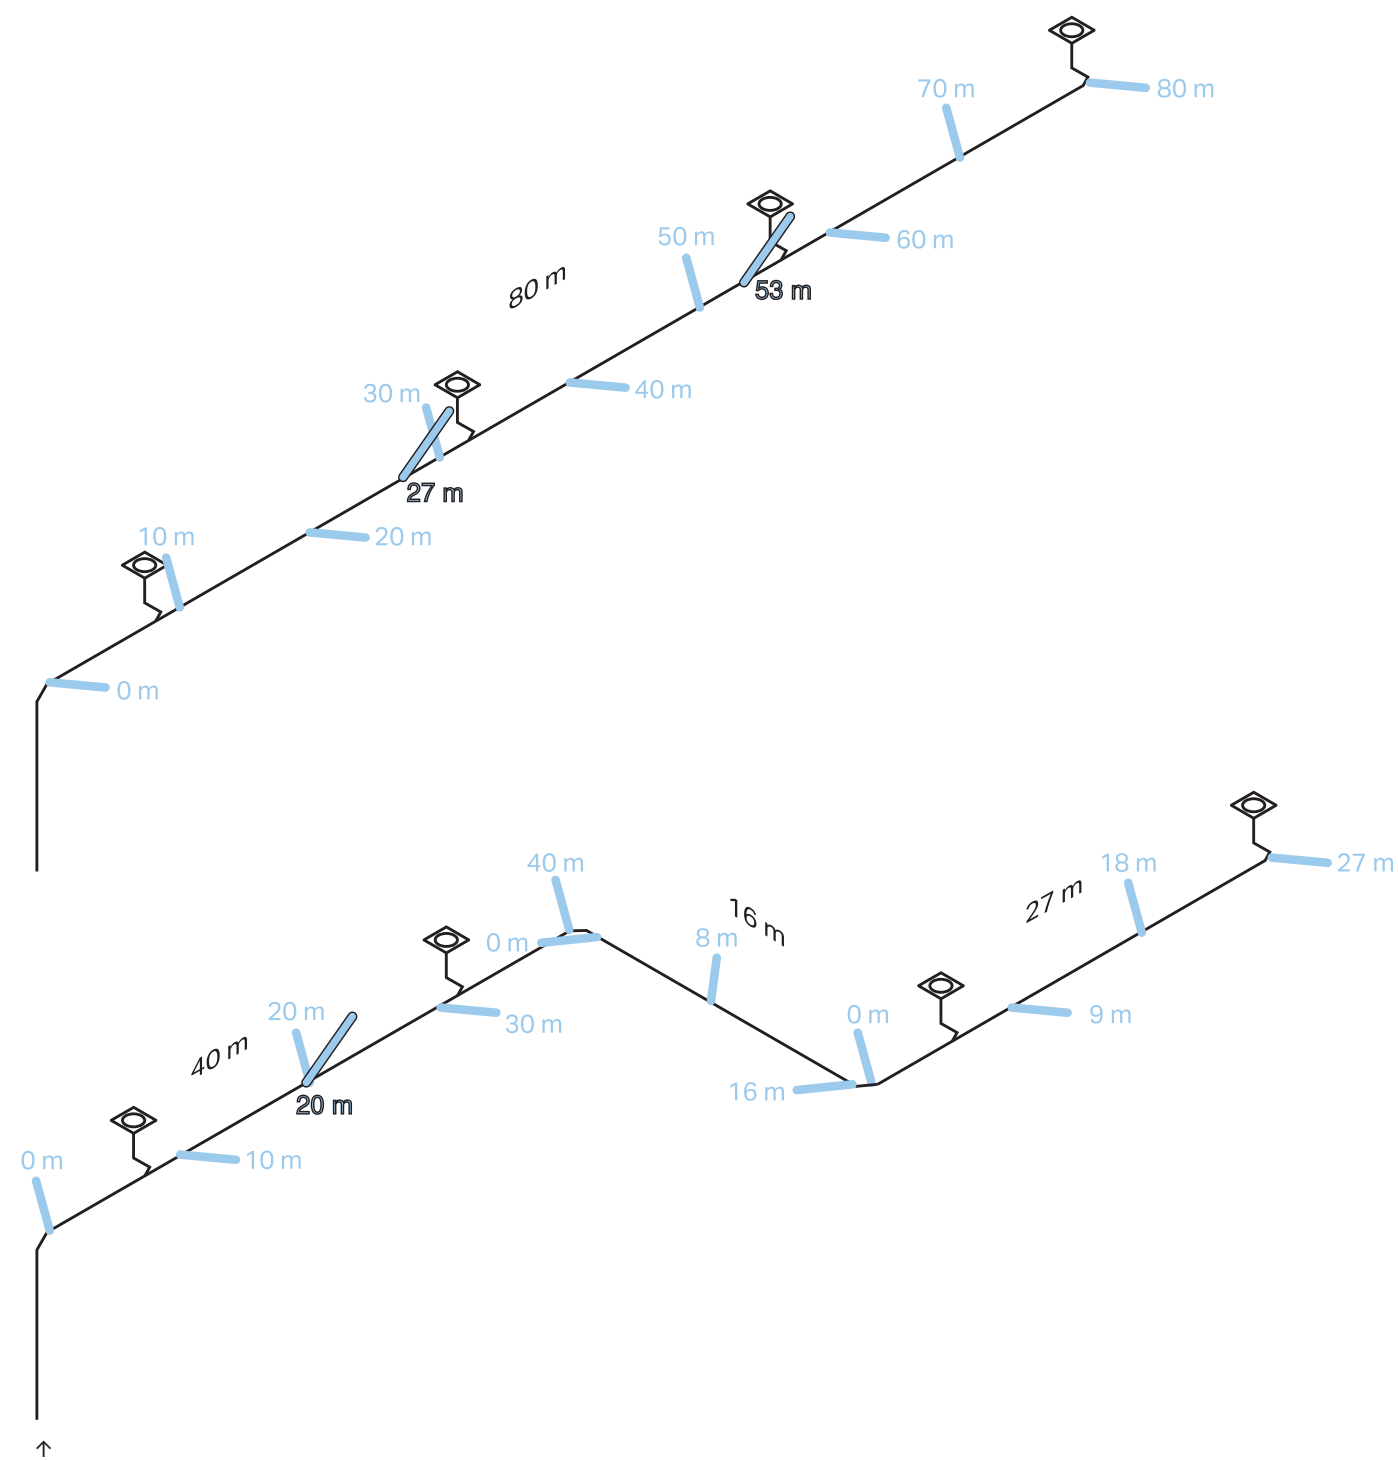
Examples of attaching supports to Geberit Pluvia connecting pipes
